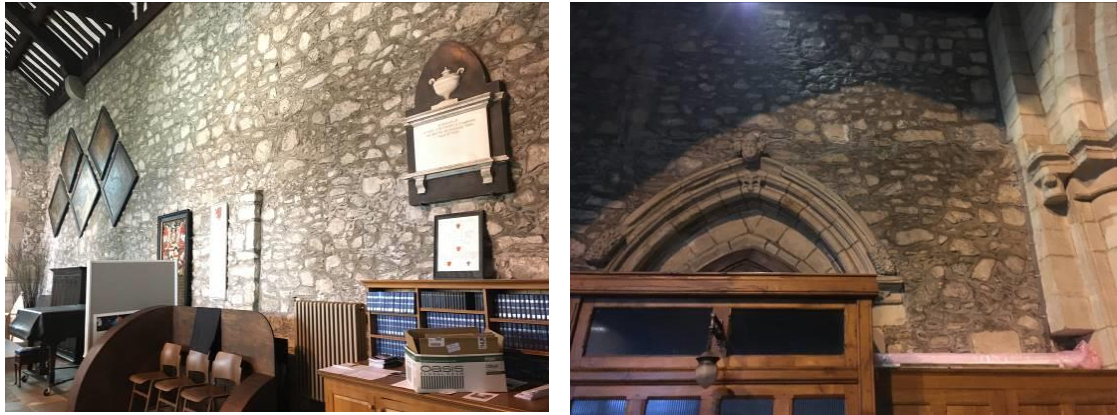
north wall of north aisle (LH) and doorway to east end of wall (RH)
